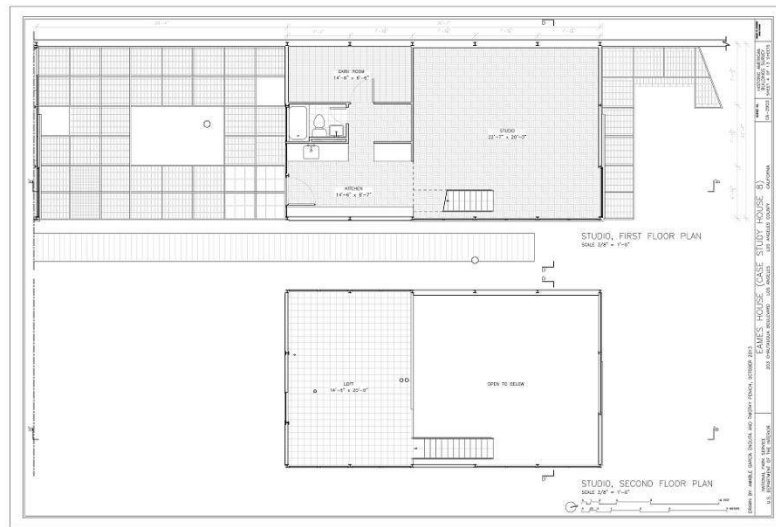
Eames House Second Floor Plan (Library of Congress 2015).
